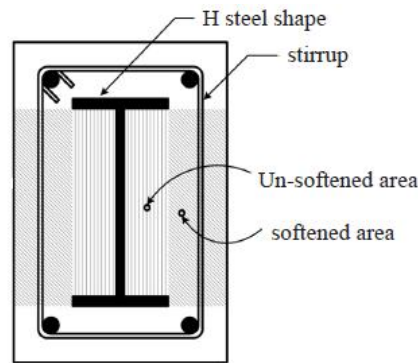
SRC Deep Beam Detailing (Chen, et al., 2018).
